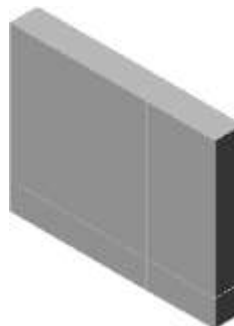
Artificial module of the multiple element curtain wall façade in figure 4.11
